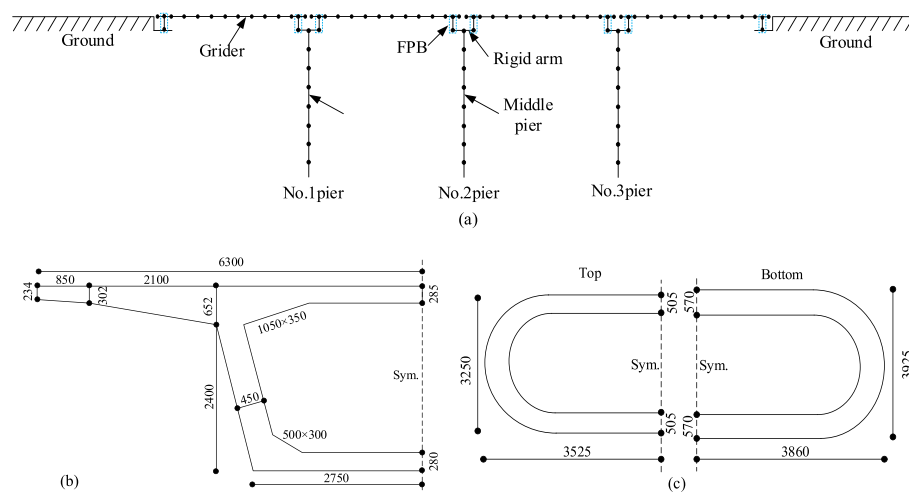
Case bridge: a simply supported bridge; b girder section; and c pier section (unit in mm)
